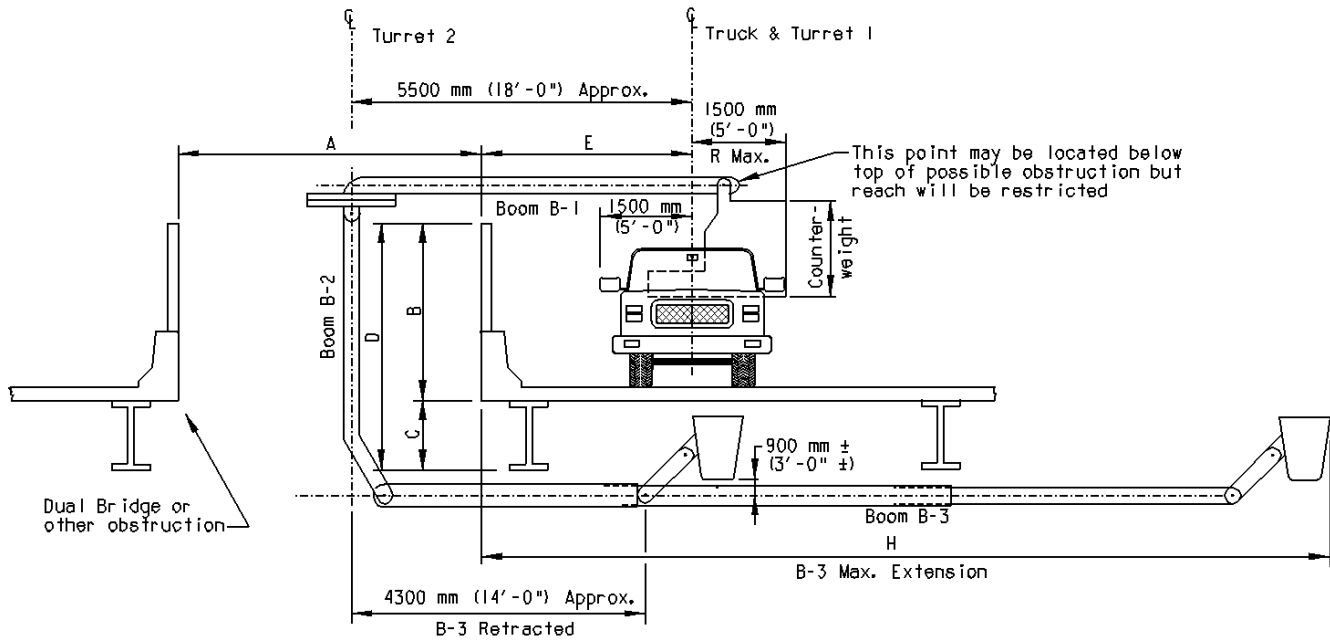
PennDOT Underbridge Inspection Crane
